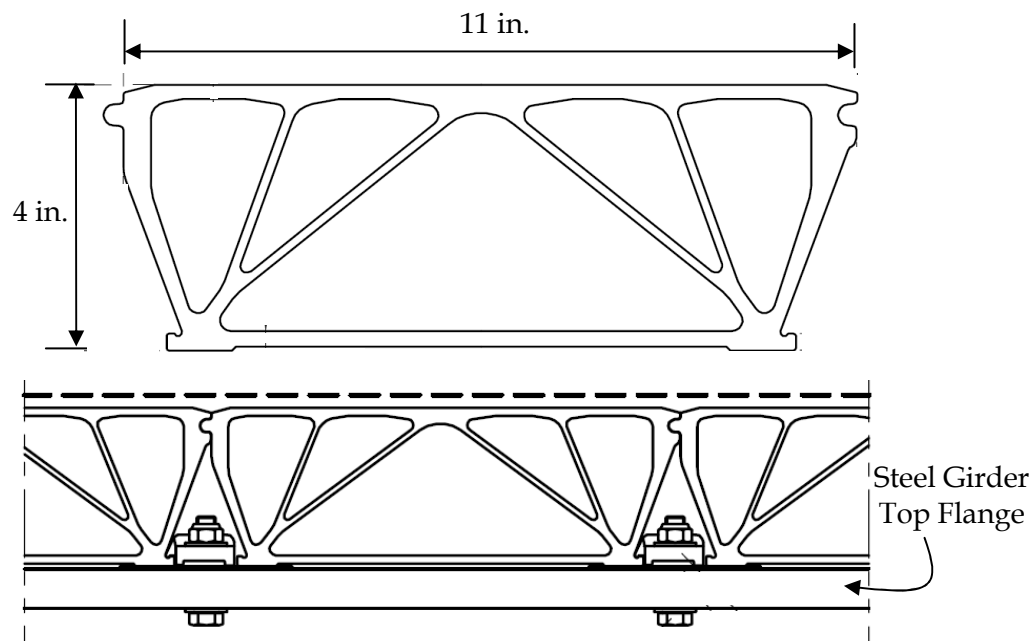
SAPA Aluminum Bridge Deck Panel
